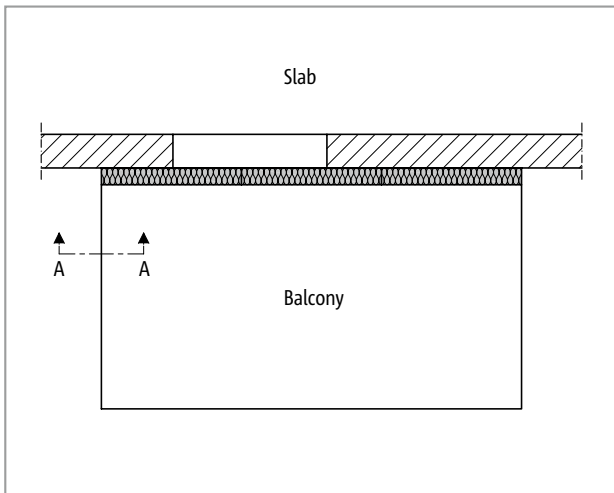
Schöck Isokorb® XT type K: Representation of the position of the cross-section A-A
